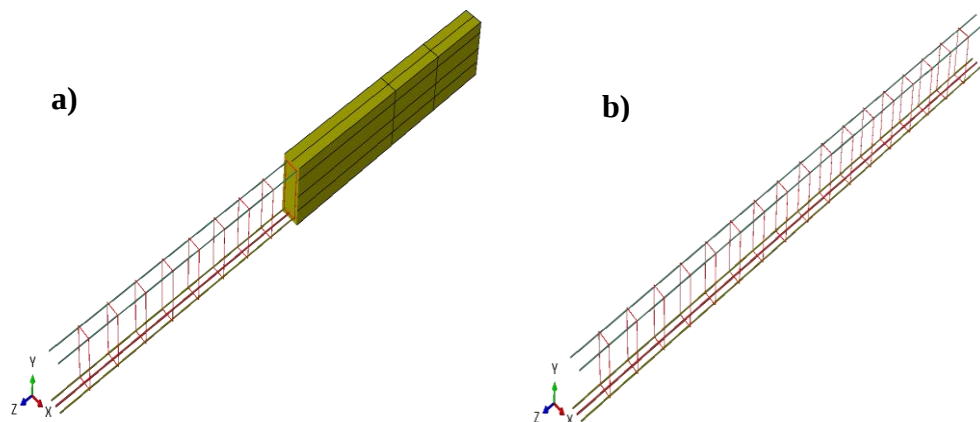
3D View Detail of a Reinforced Concrete Beam
